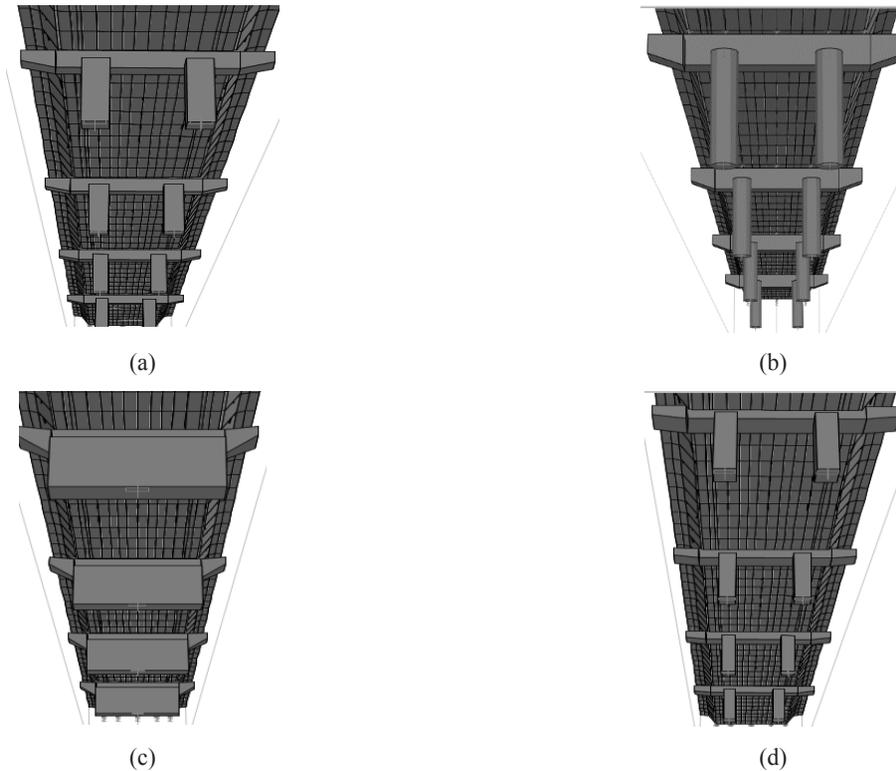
Bridges models : (a). Square pier form, (b). Circle pier form, (c) . Solid wall pier form, (d). Rectangular pier form (Naser 2022).
